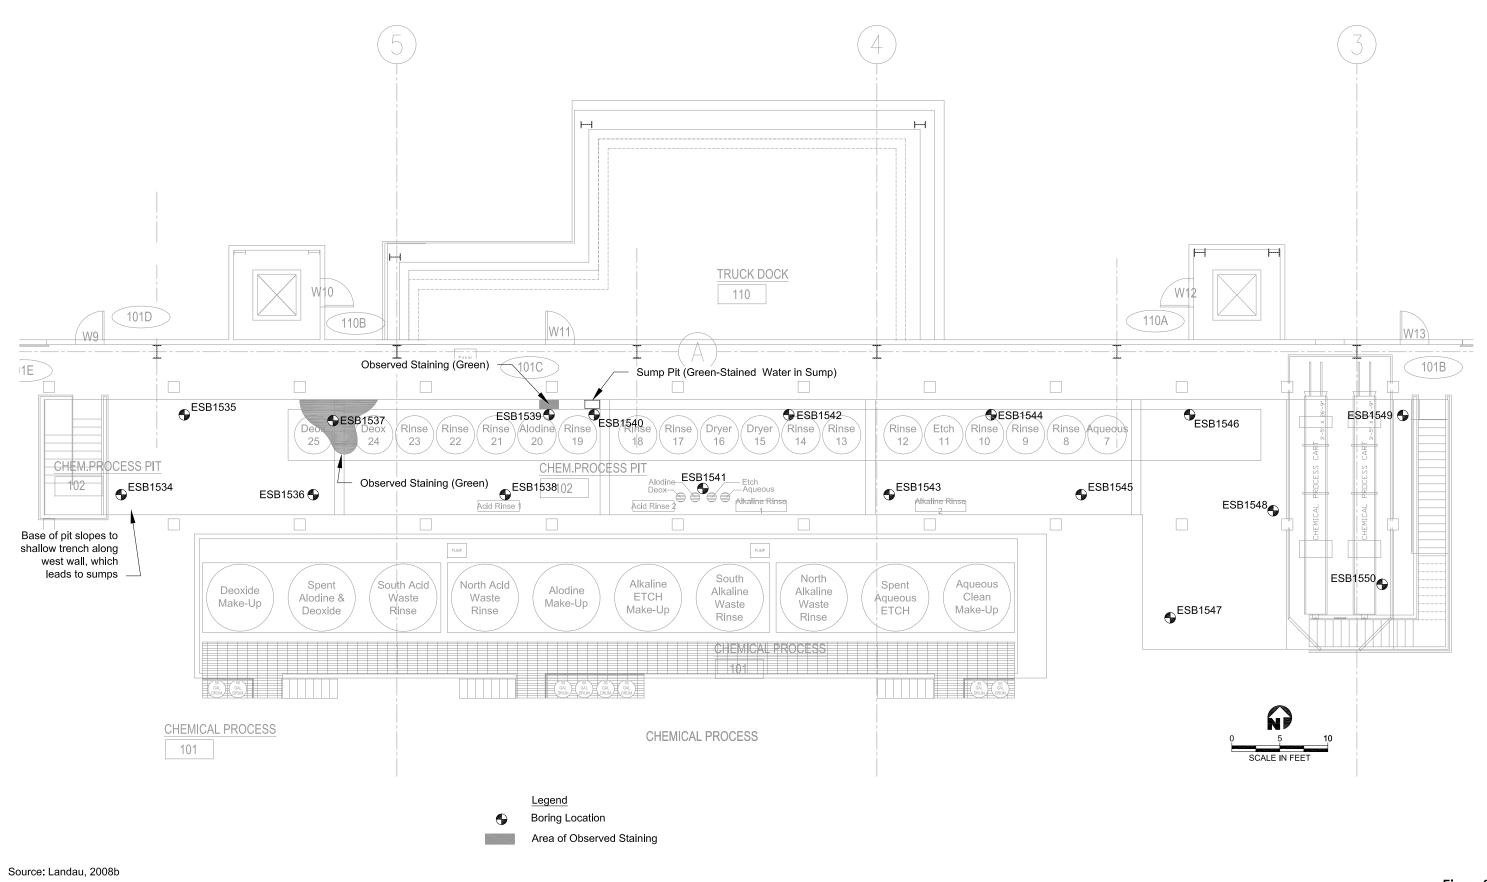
Building 40-02 Tank Line Pit Boring Locations
